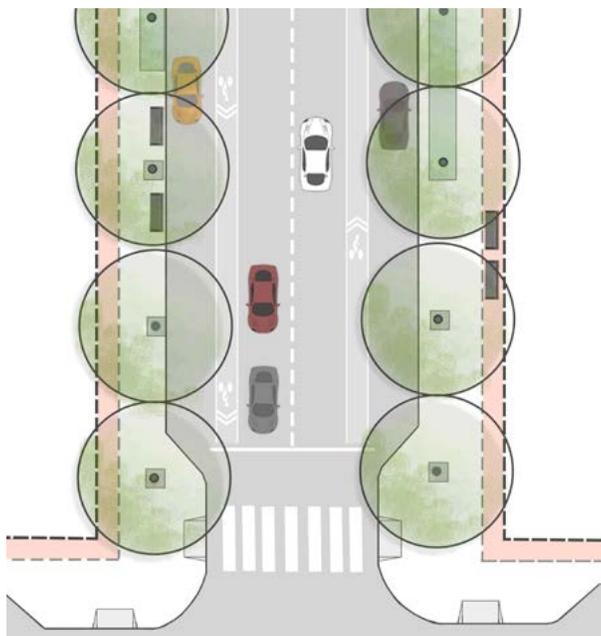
(1). 300 East and 500 East Cross Section and Plan-view
